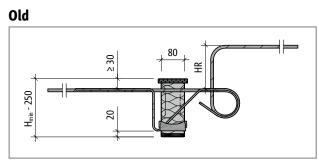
Schöck Isokorb® T type K-HV: Product sectiont
